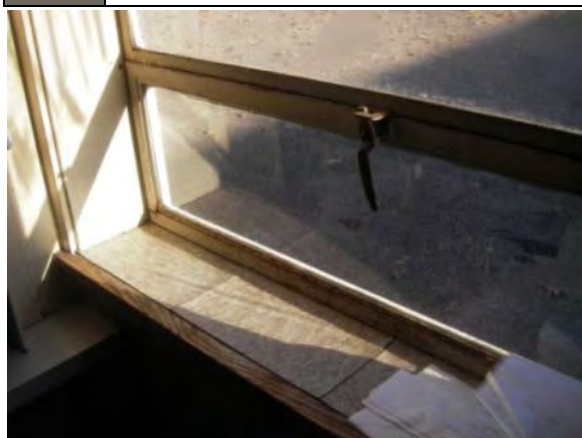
1952 WING ALUMINUM WINDOW FRAMES AND SINGLE-PANE GLASS
